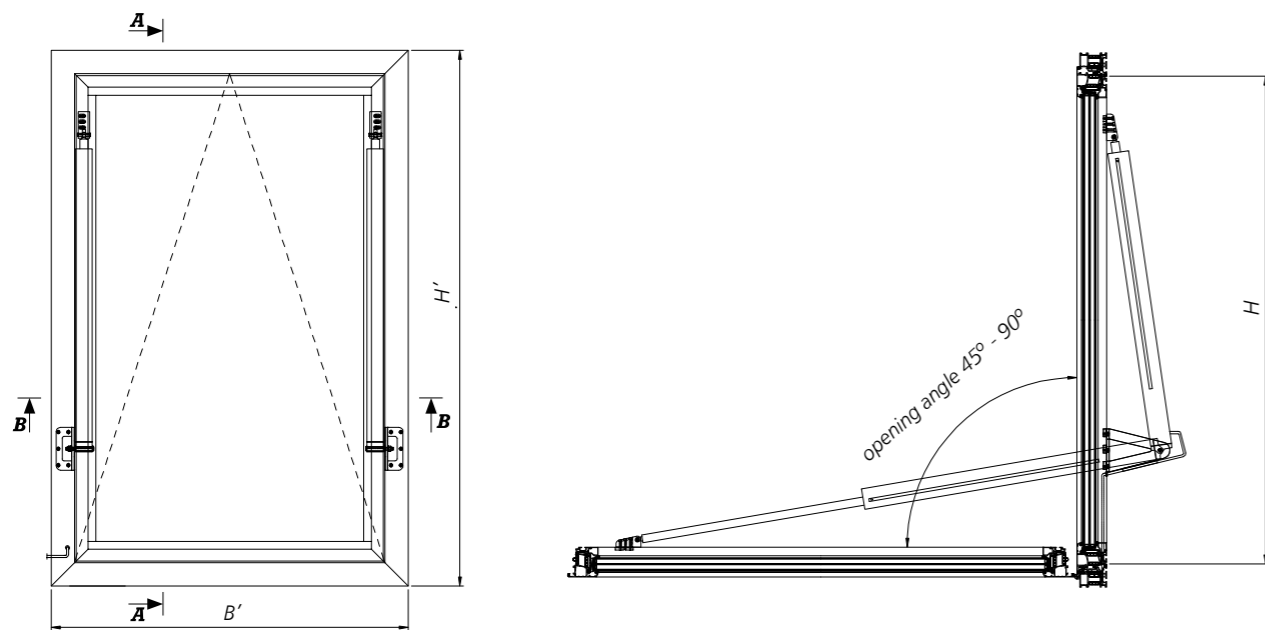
view from inside of the mcr OSO THERM 75 smoke exhaust window with G spindle actuators in closed position
